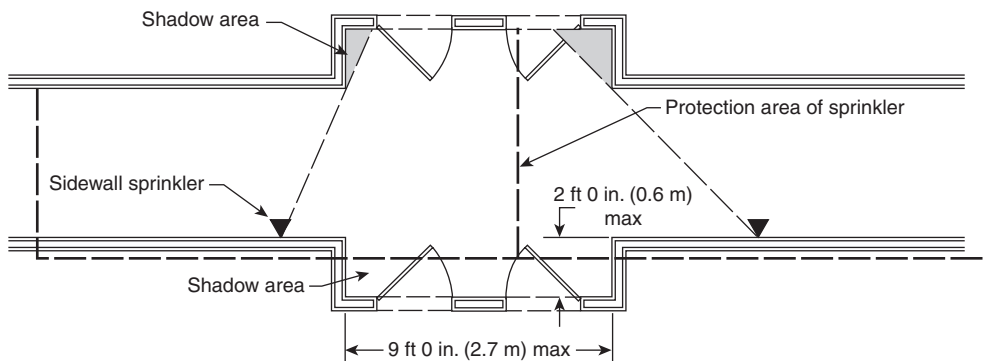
Shadow Areas Behind Sidewall Sprinklers in Corridors.
